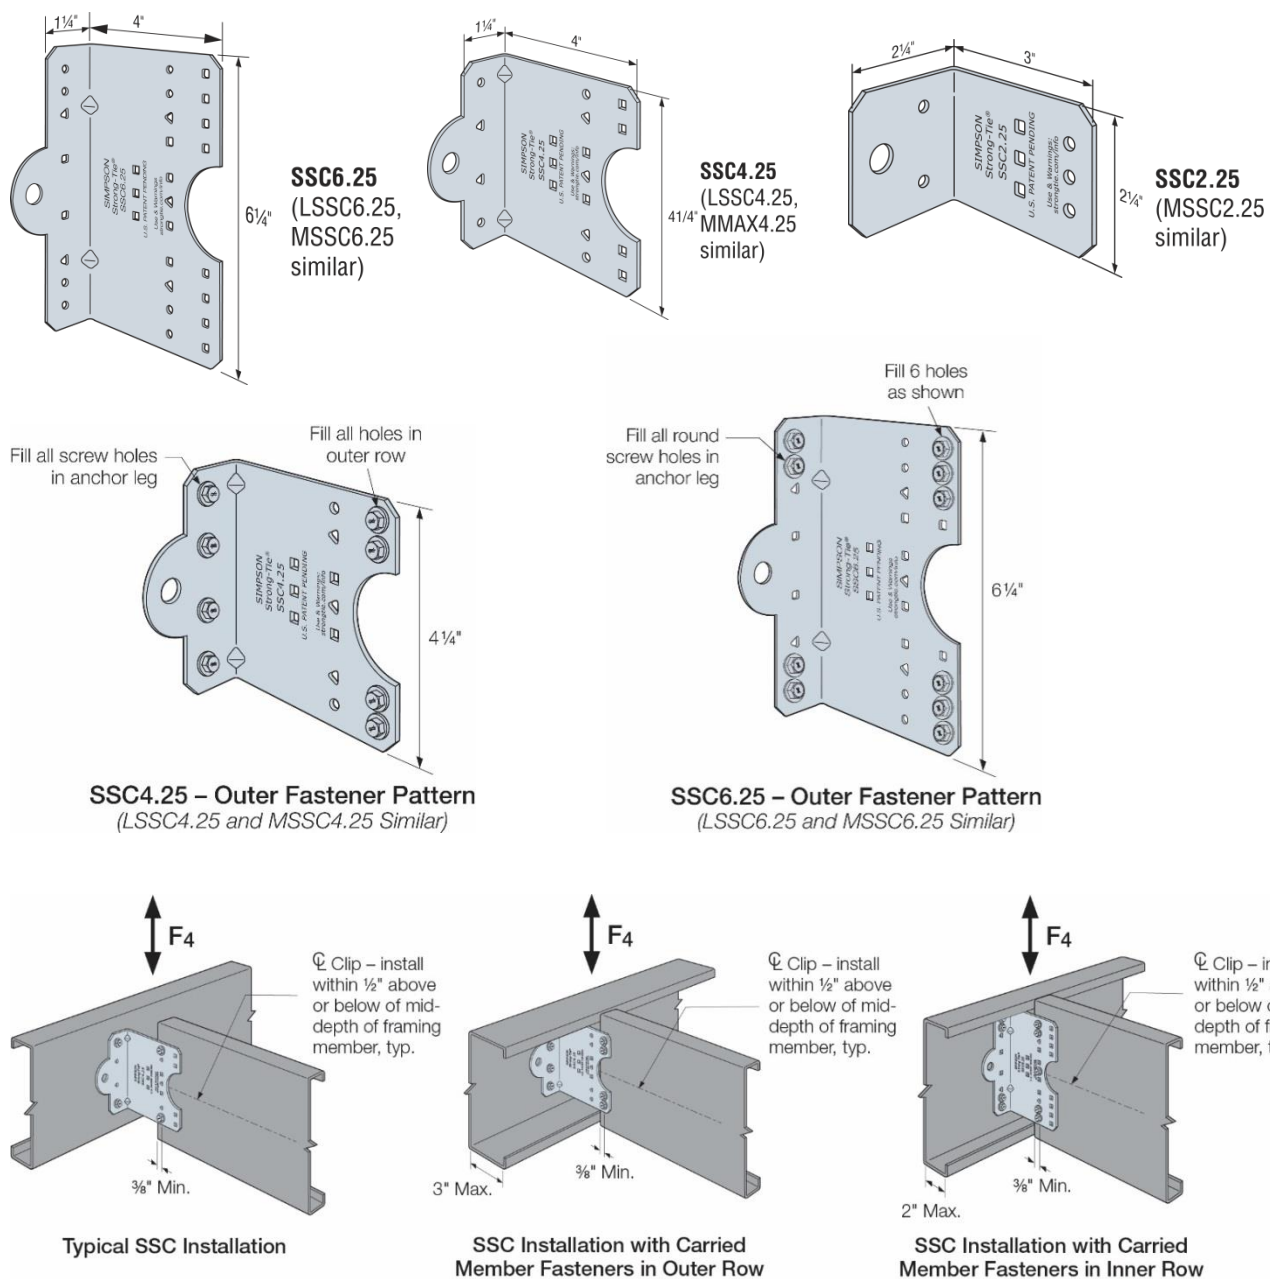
A—SSC CONNECTORS AND INSTALLATION DETAILS
